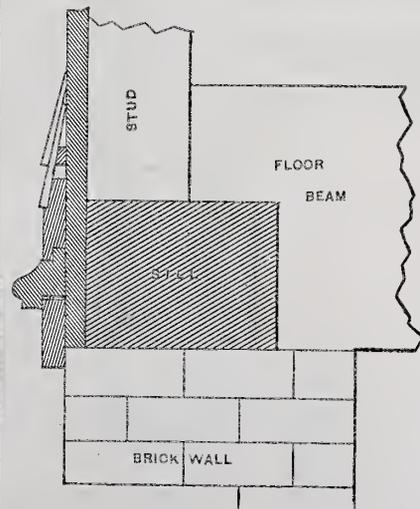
Section Showing Construction of Water Table.—Scale, 1 1/2 Inch to the Foot.
